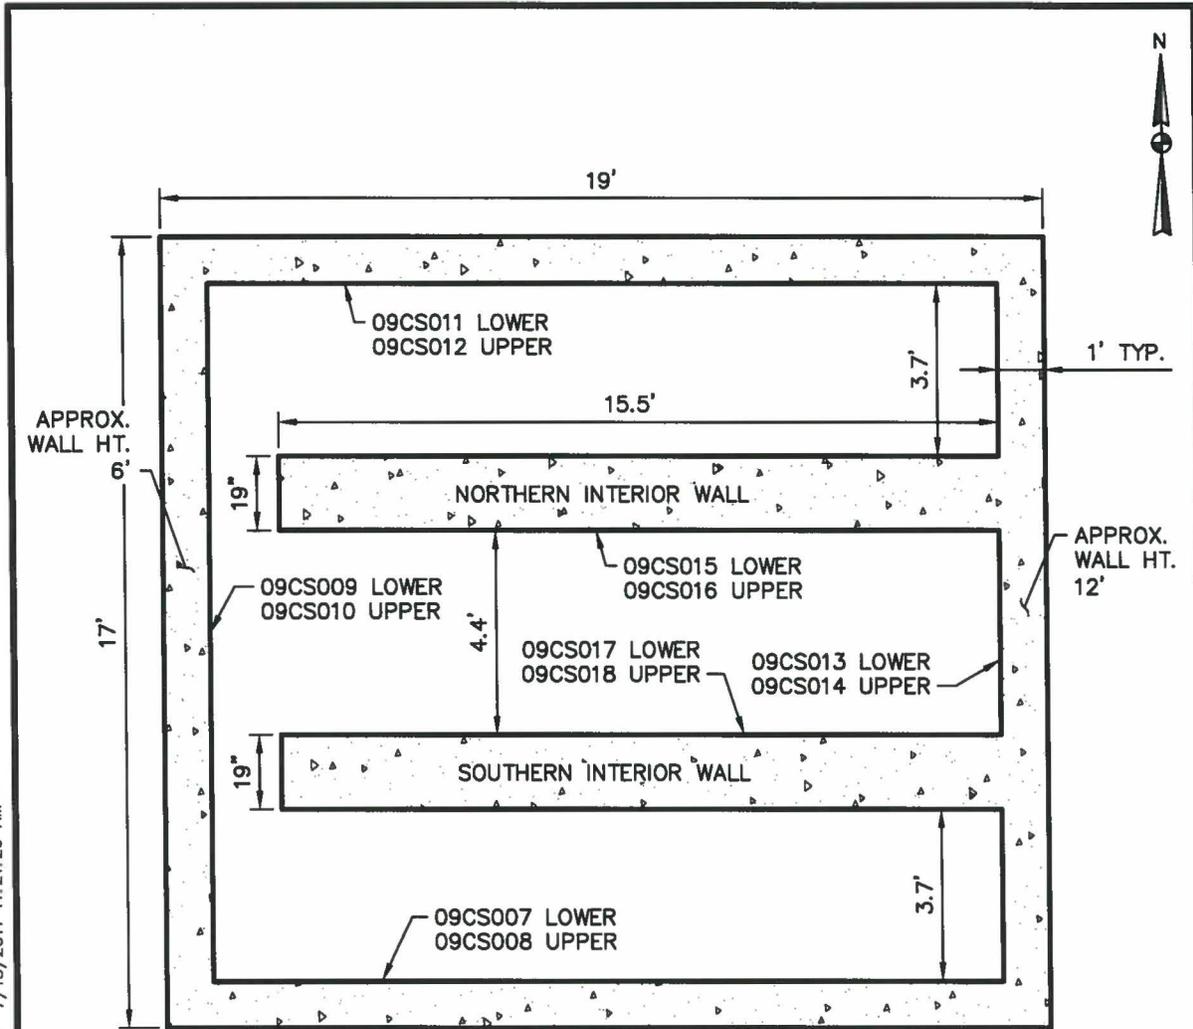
Concrete Sampling at Wash Rack – Plan View
